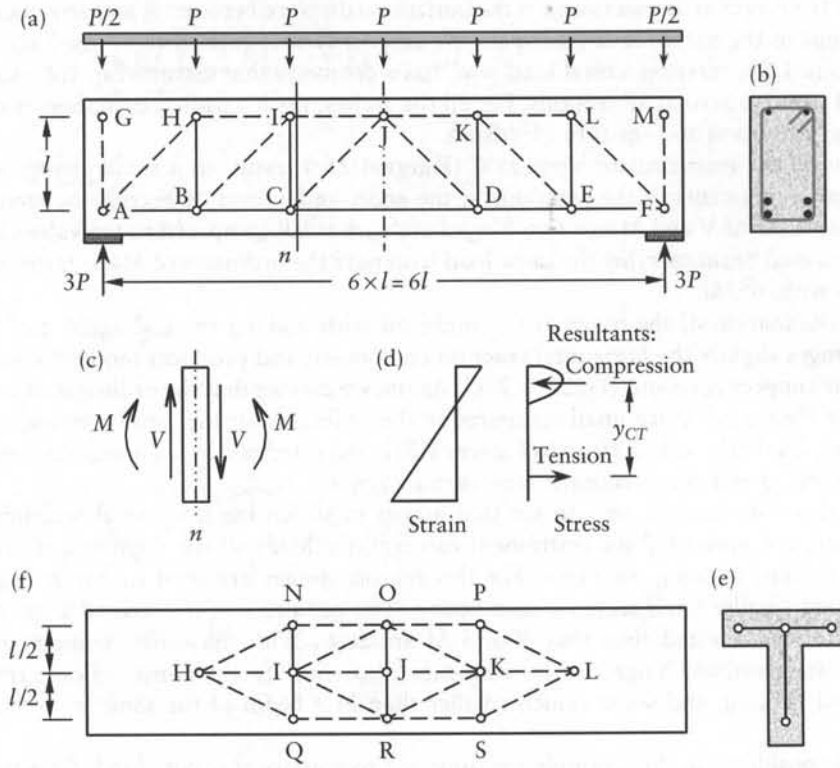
Strut-and-tie models for the idealization of a cracked simply-supported beam. (a) Plane truss idealization of the beam with rectangular cross section. Also elevation of a space truss idealization of the beam with T-cross section. (b) Rectangular cross section of beam. (c) Internal forces at section n . (d) Strain and stress distribution at n . (e) Cross section of spatial truss idealization of a T-beam. (f) Top view of spatial truss.
